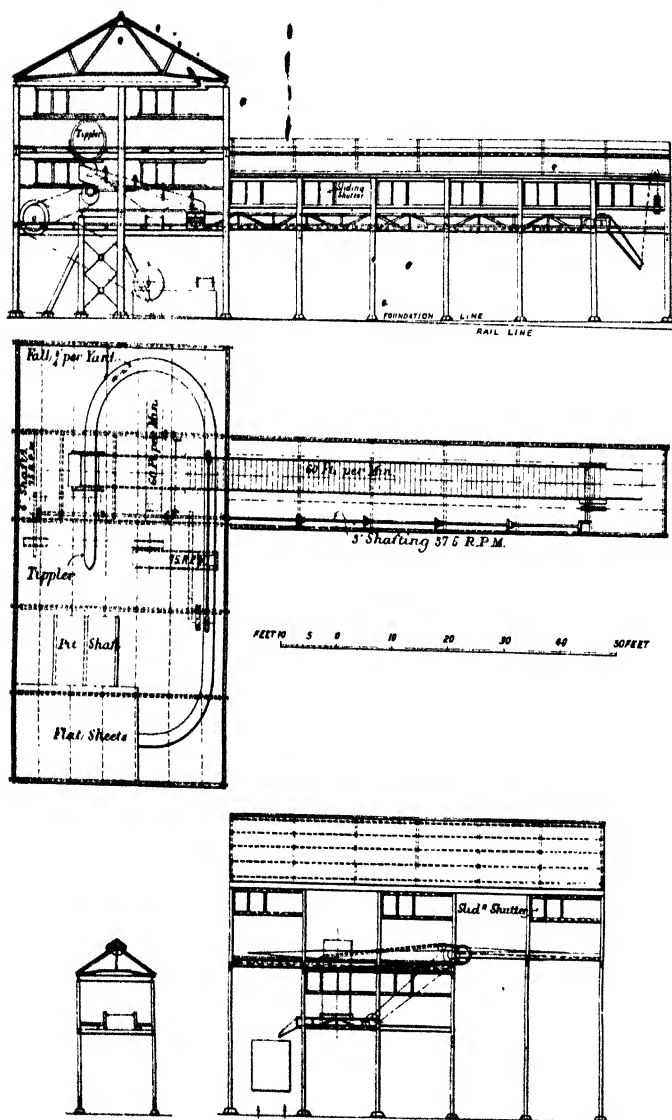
Colliery Hooptead. Side and end elevations and plan.
